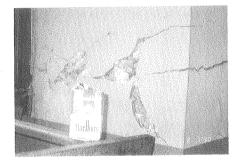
Mineral rock used as aggregates in St. Louis University (Girls' Campus)
